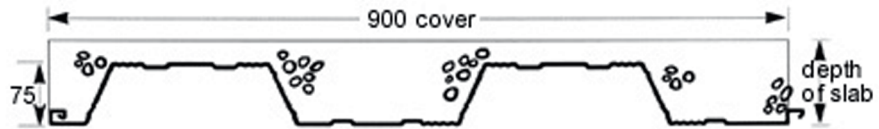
Details and tables of Bond dek permanent shuttering flooring
